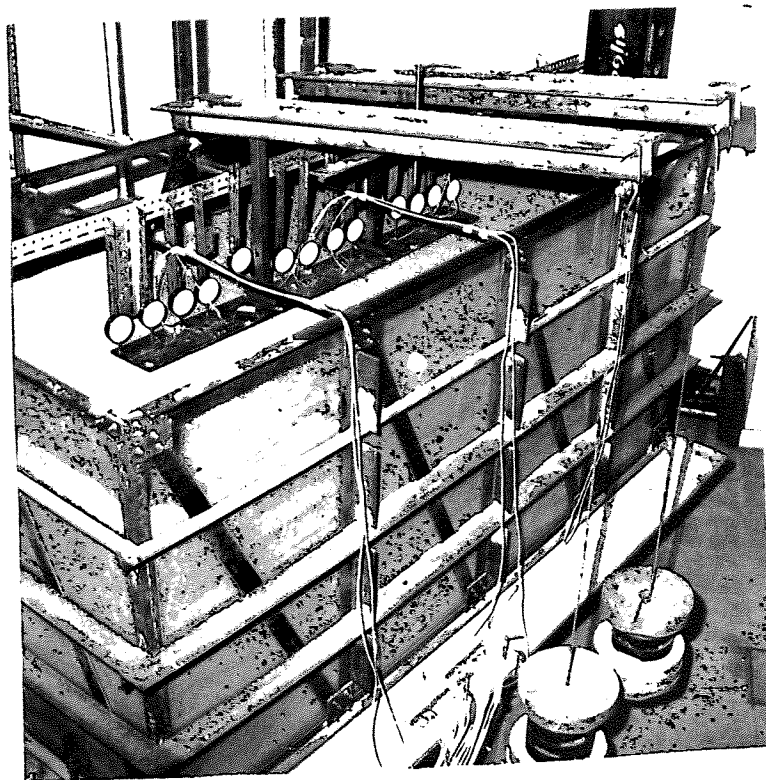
THE FLAT BEAM UNDER TWO POINT LOADS
